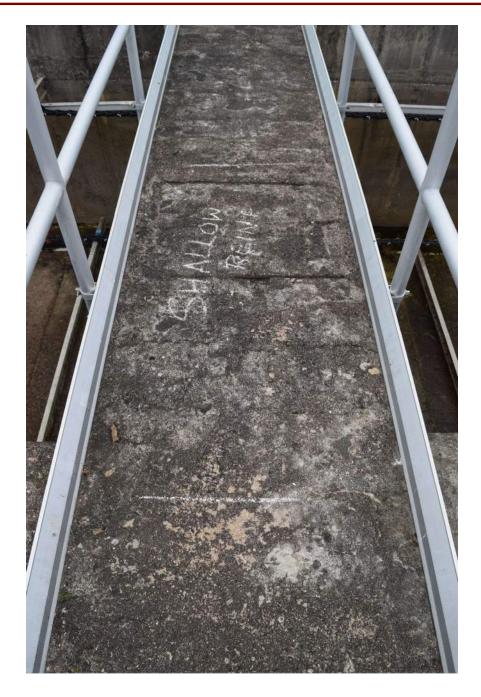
Center Bracing Strut/Catwalk (Looking North)
